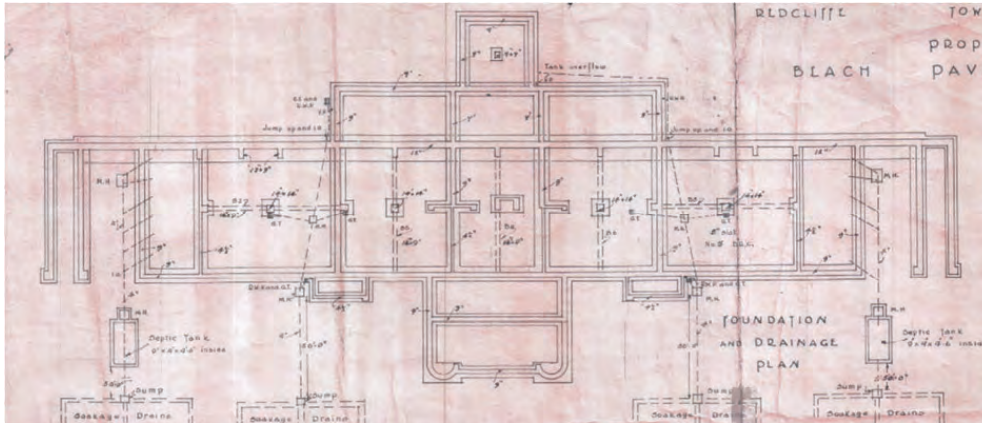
Excerpt from original blue prints showing footings and sub floor walls.
